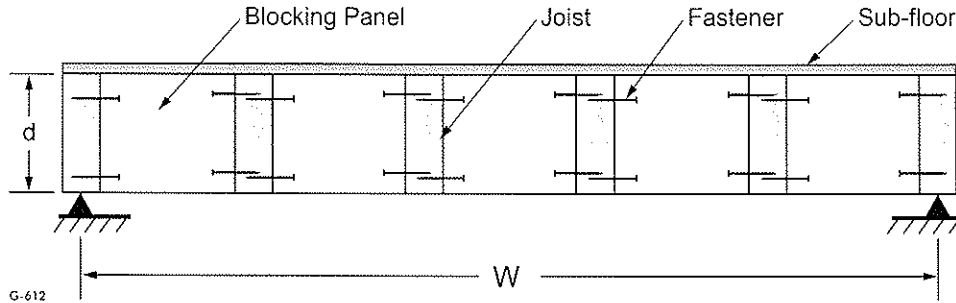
Cross-section of a timber floor with bridging/blocking panels
